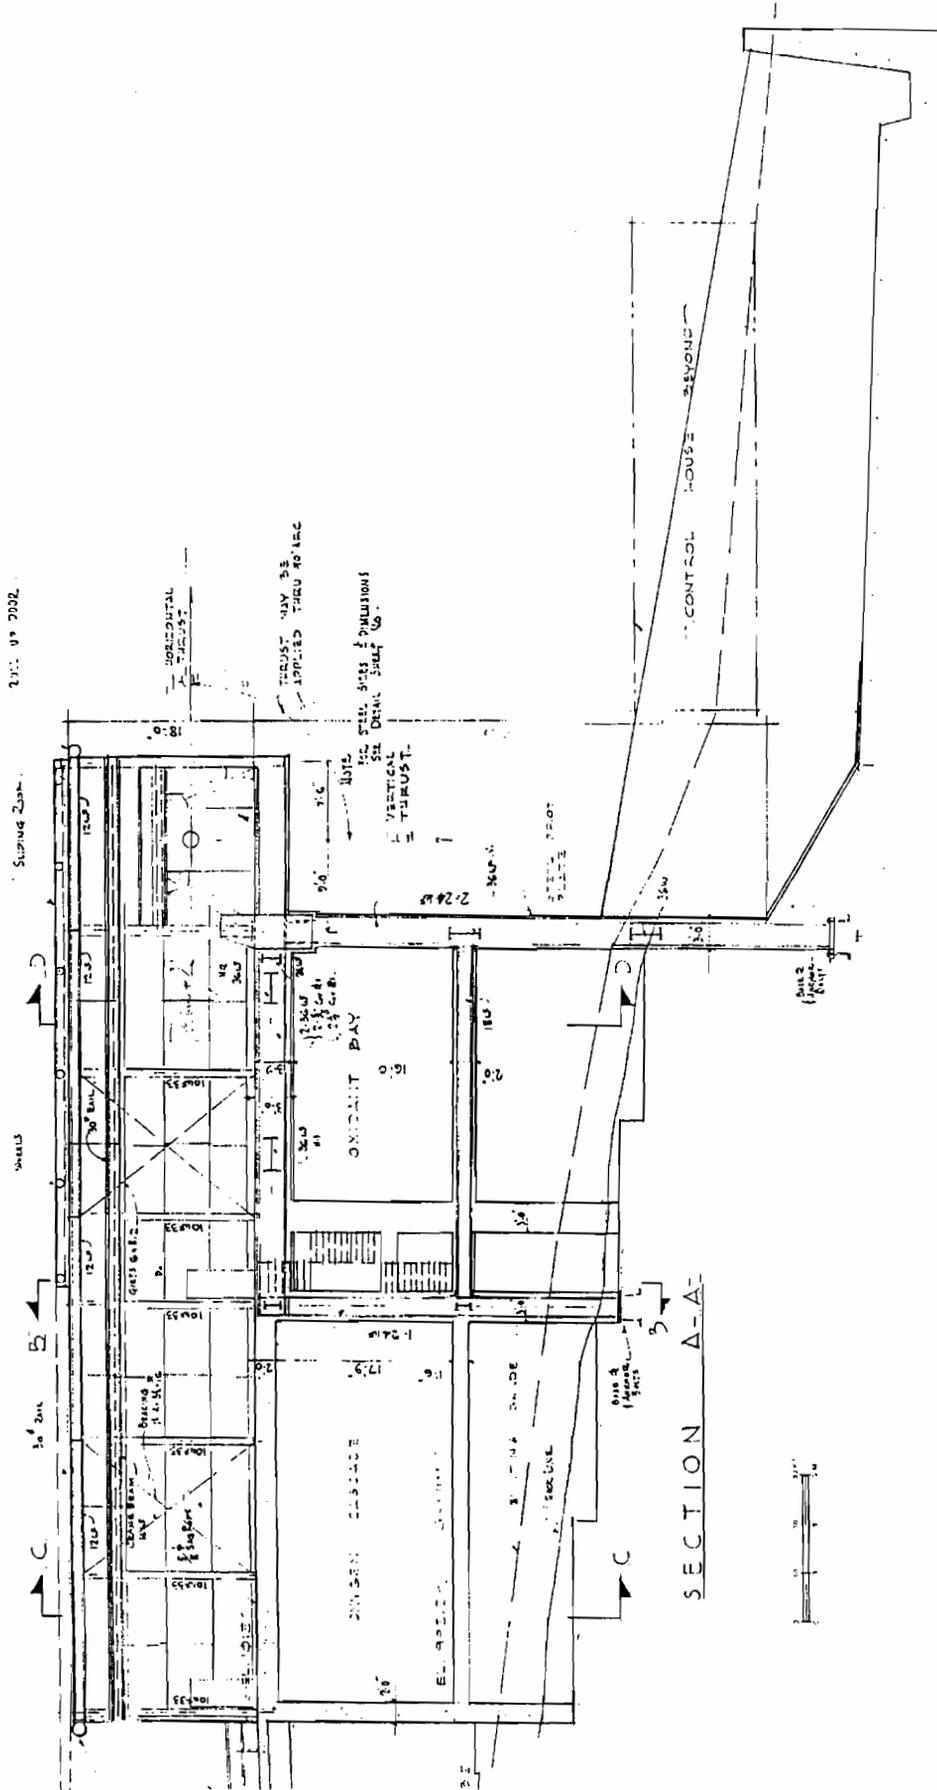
Building 3618, Test Area E-1, Blueprint # DP-142548, detail of first floor from Rocket Test Stand E-1, Roof Plans, Frank Grad & Sons, Architects and Engineers, Newark, NJ and Washington, DC. Picatinny Arsenal, Morris County, New Jersey (on file in DPW, Picatinny Arsenal).
